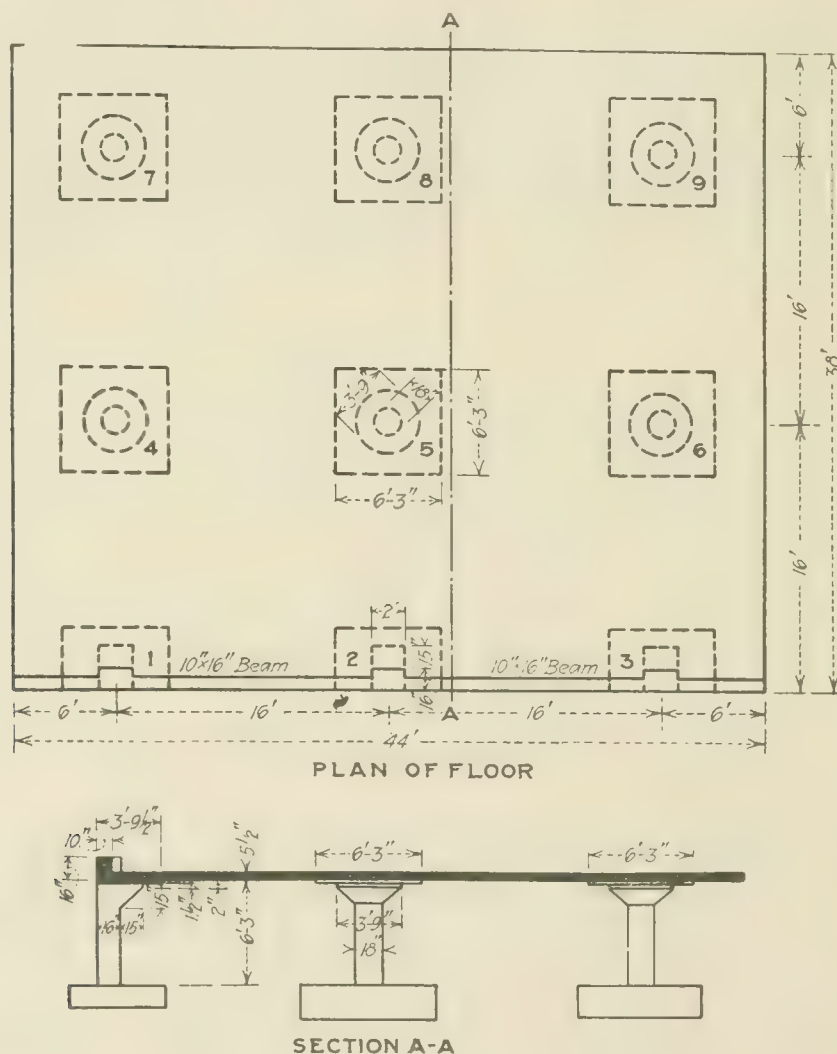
FLAT SLAB STRUCTURE TESTED.
